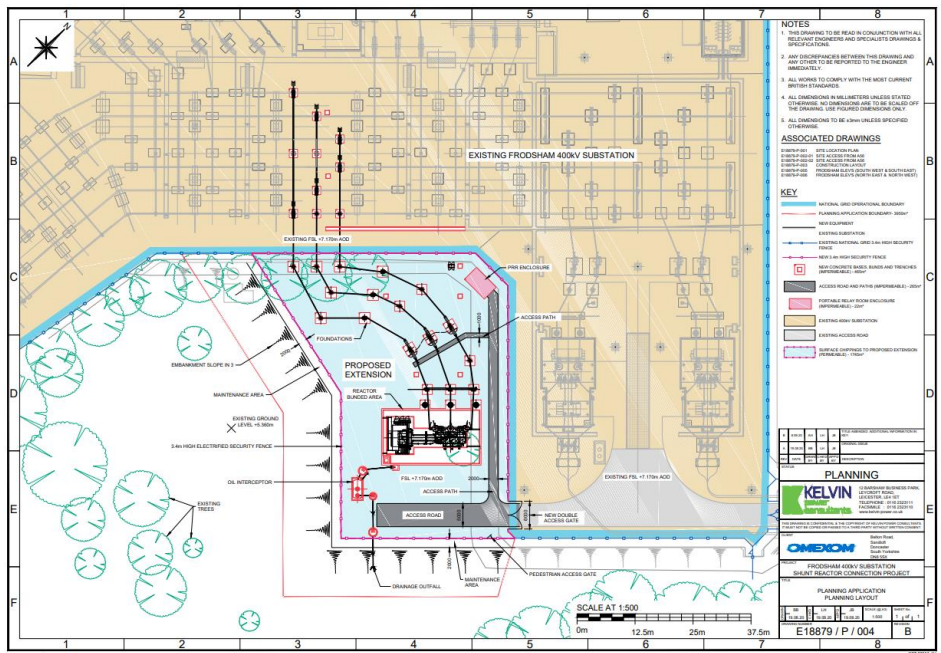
Frodsham 400kV substation site layout plan showing the spare bay and MRP connection.⁶
